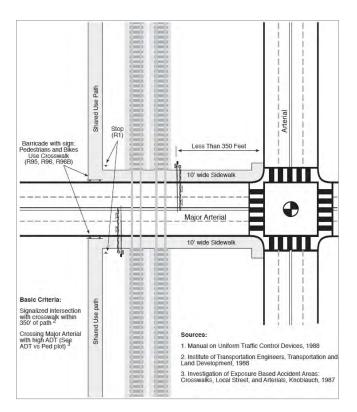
Roadway Crossing Type 3 (Reroute Trail Users to Nearest Signalized Intersection)
